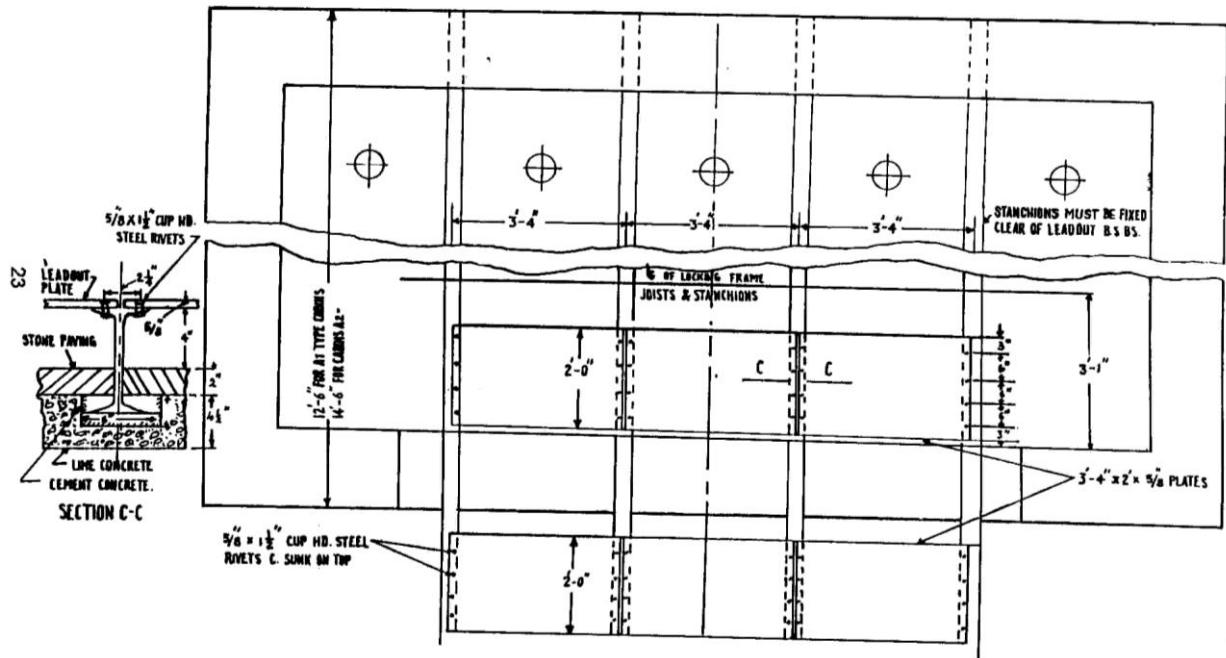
(a) TYPICAL LEAD OUT PLAN
